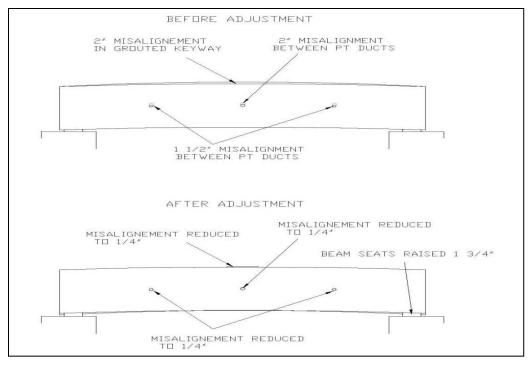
Adjusting Beams to Align Post Tensioning Ducts
